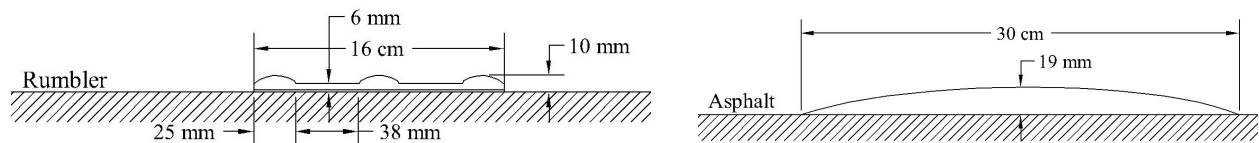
Rumbler rumble strips cross section; Asphalt rumble strips cross section (Meyer and Walton, 2002).
